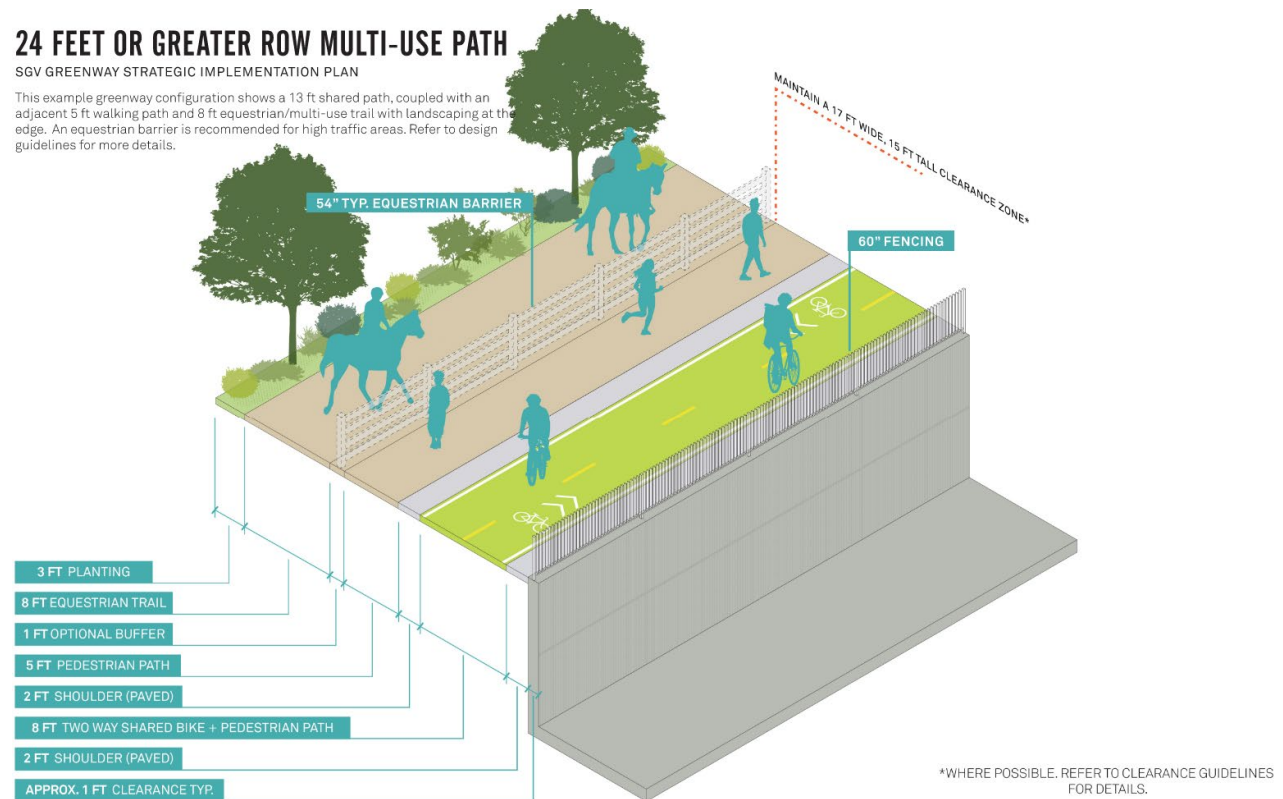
Multi-use greenway (multi-use trail, bikeway, and green infrastructure stormwater management) in wide ROW
